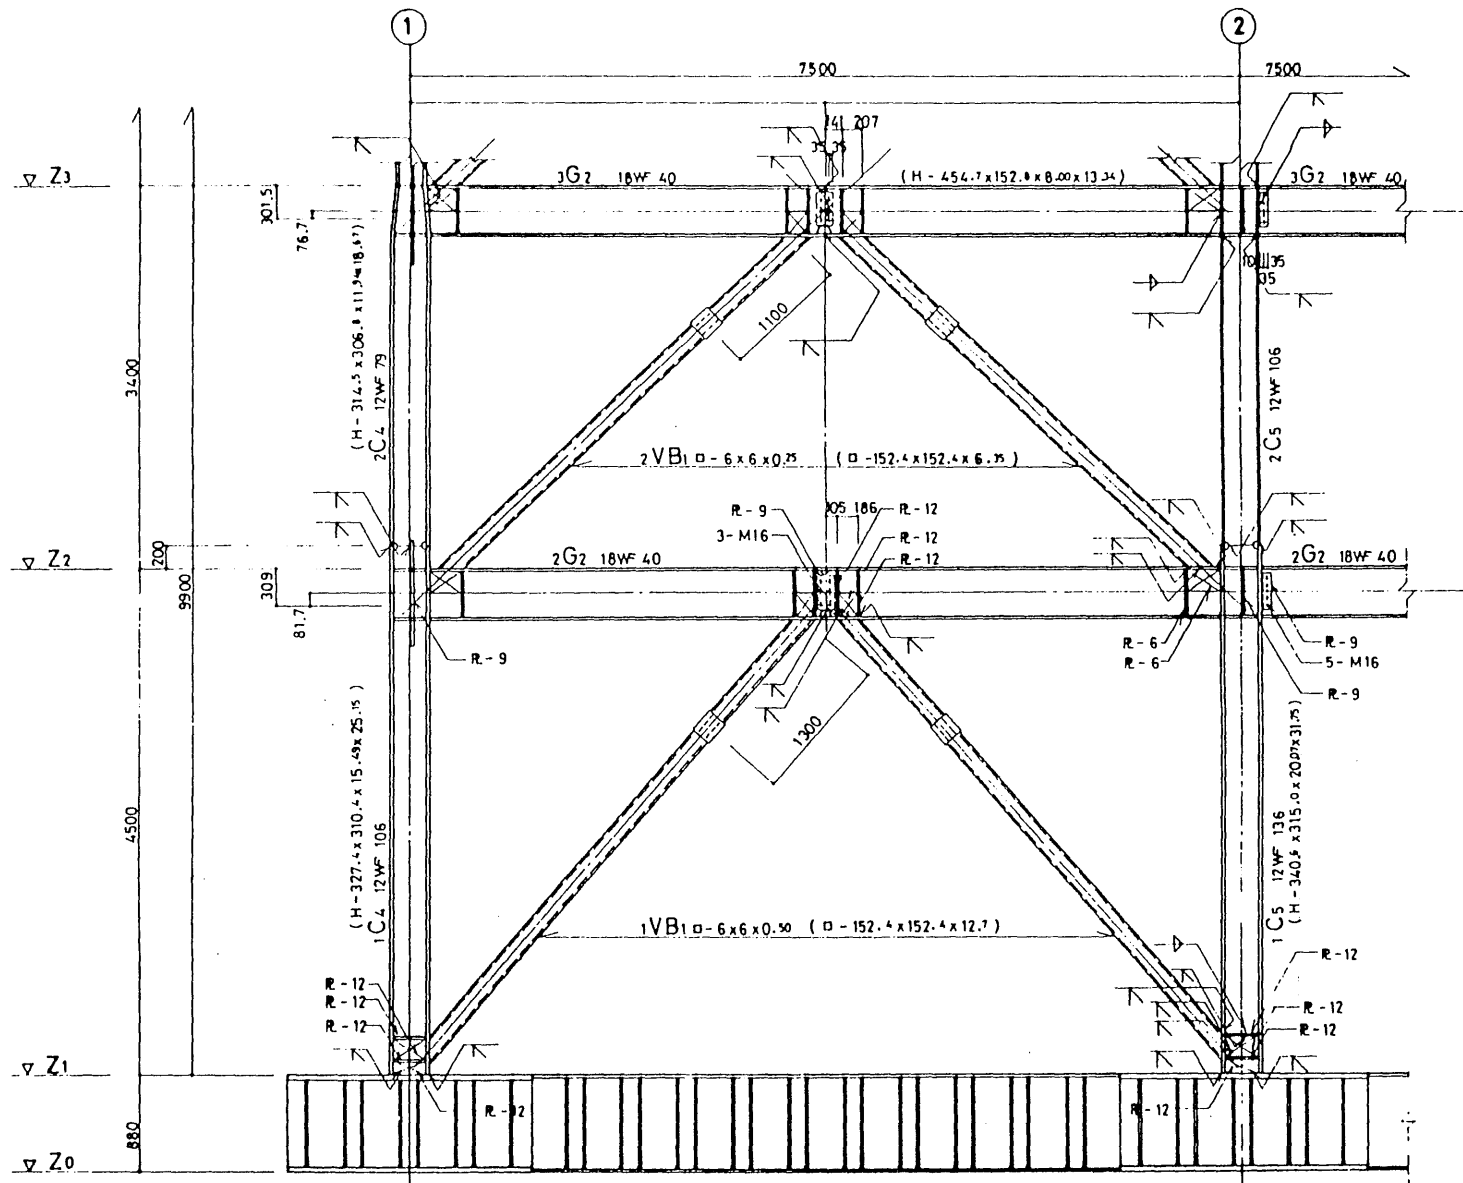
Elevation view of Frame B for the concentric braced test structure of Phase I - story 1 and story 2 of 1-2 bay
